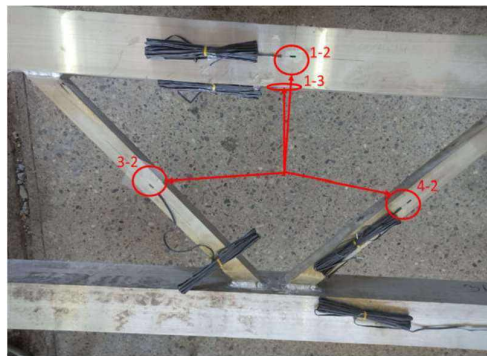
Location of strain gauges of testing aluminum truss girder.
